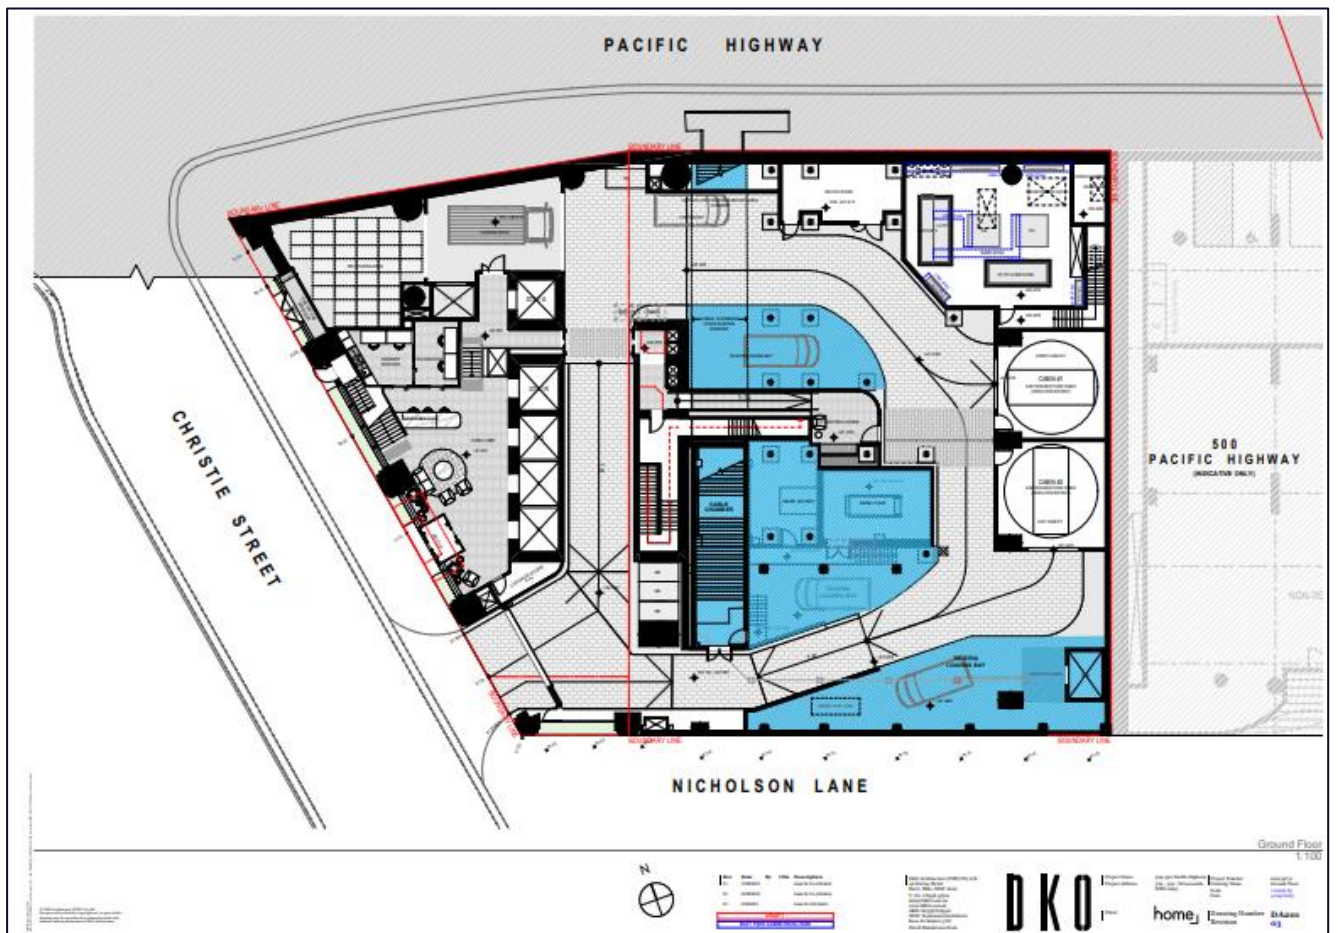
Proposed Ground Plan of 524-534 Pacific Highway (DKO Architecture, 2023)
